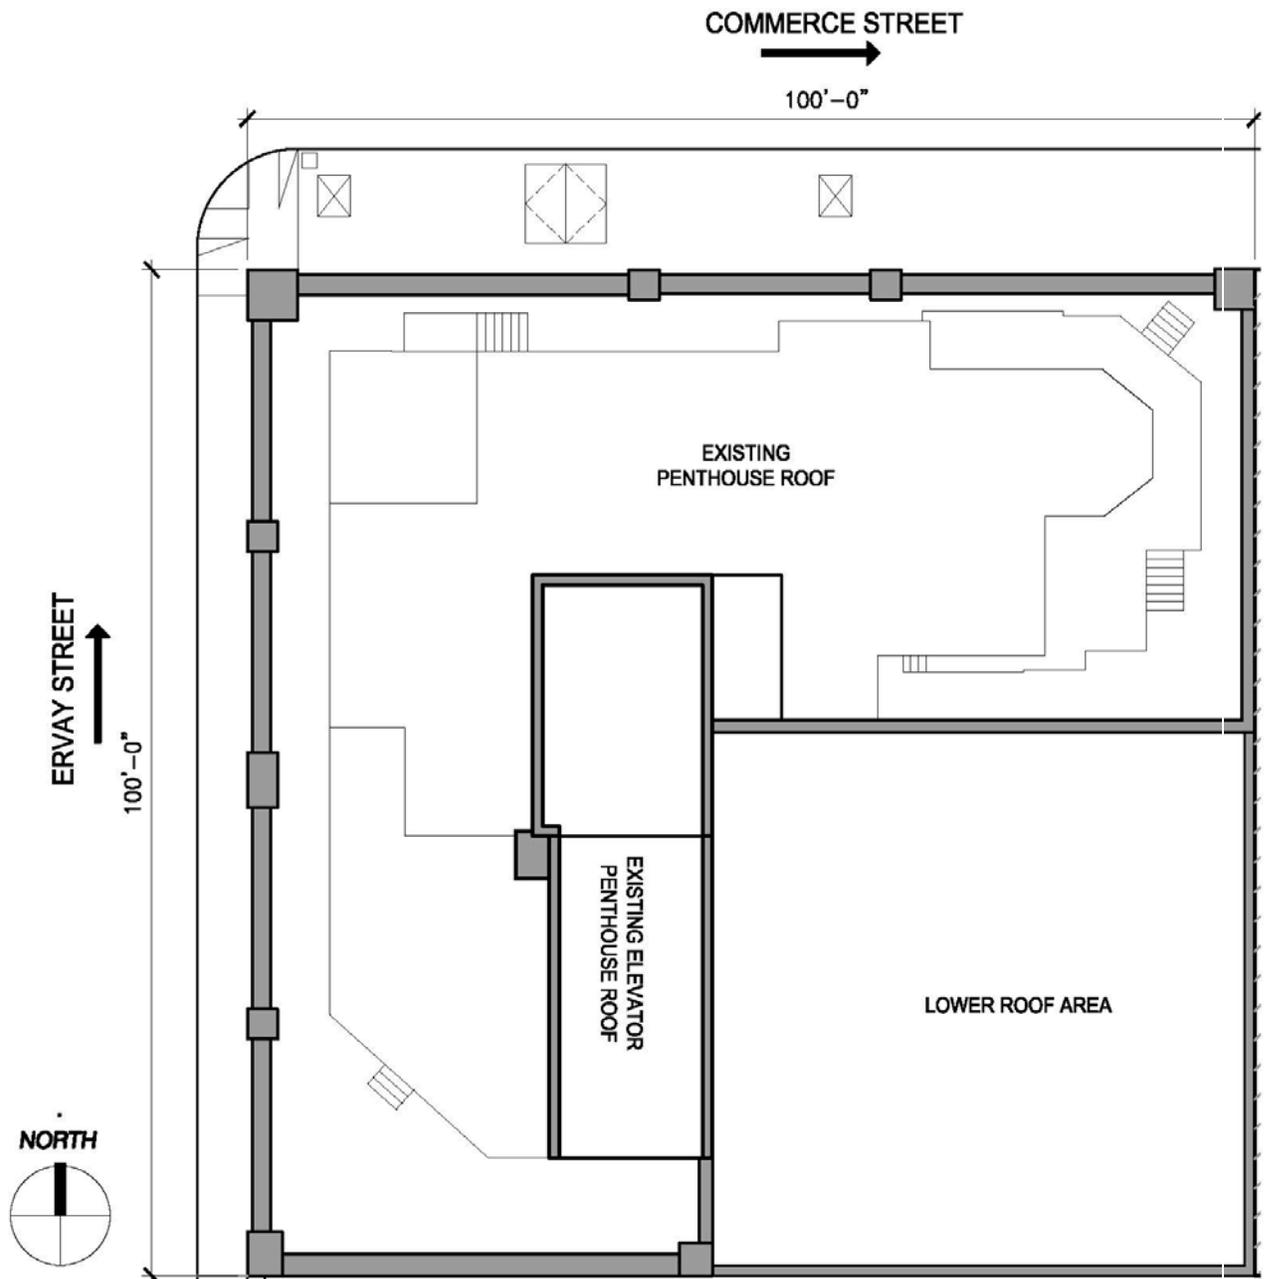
Site Plan showing upper roof with existing penthouse and lower roof (Merriman Associates, 2014).
